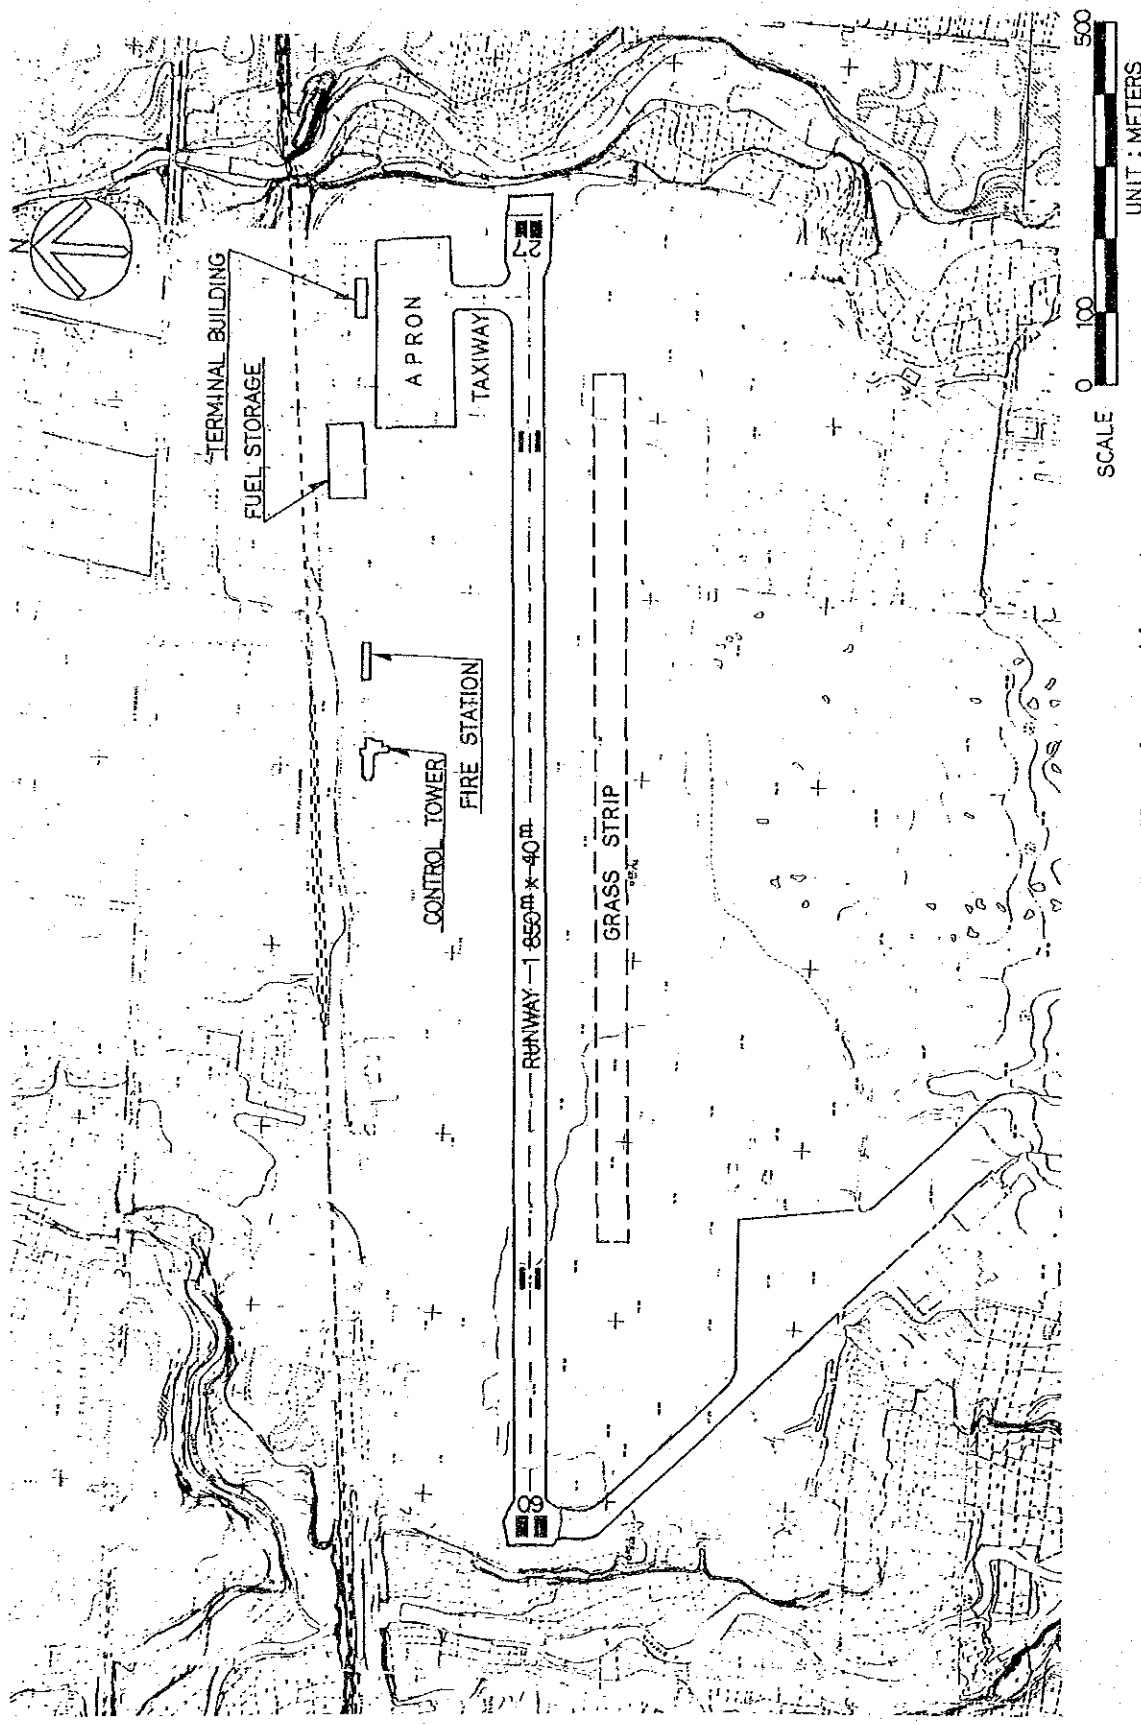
Layout Plan of the Existing Yogyakarta Airport
